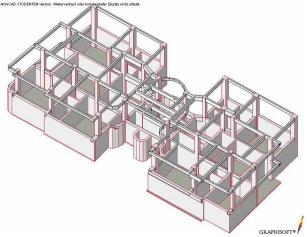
Axonmetrie of current floor and structure of "Interbelic" (from Bostenaru[4])
